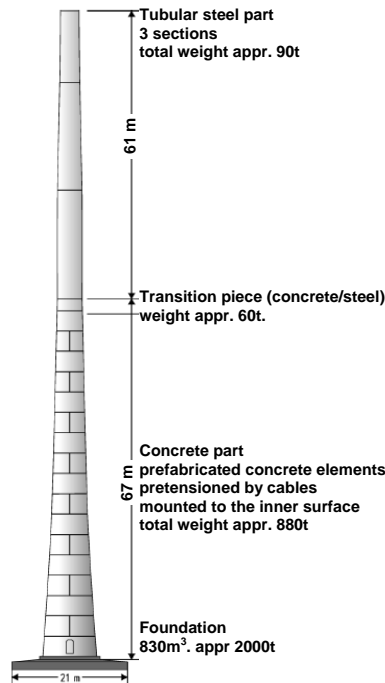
Constructional concept of the concrete/steel hybrid tower designed for the Repower 3.3 MW wind turbine (Max Bögl Group) (adapted from Hau, 2013)
